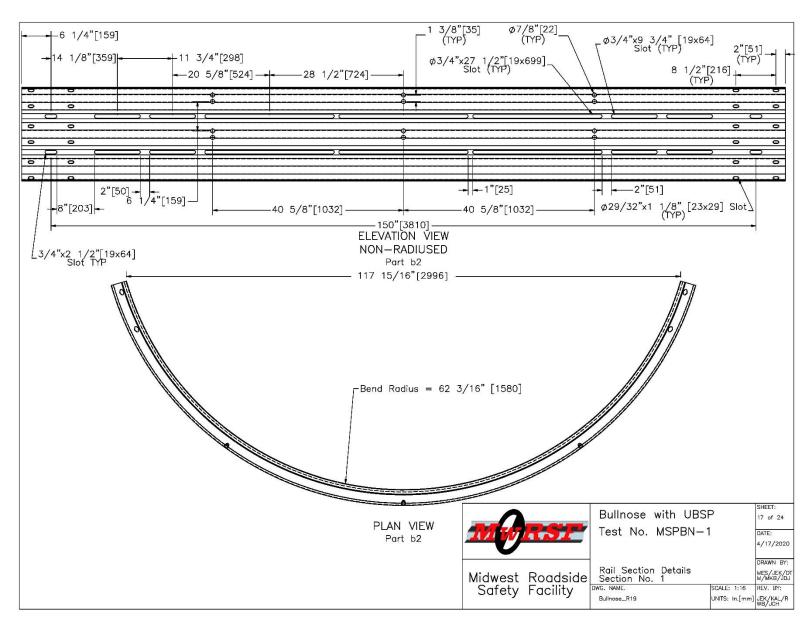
Rail Section Details Section No. 1, Test Nos. MSPBN-1 through MSPBN-3
